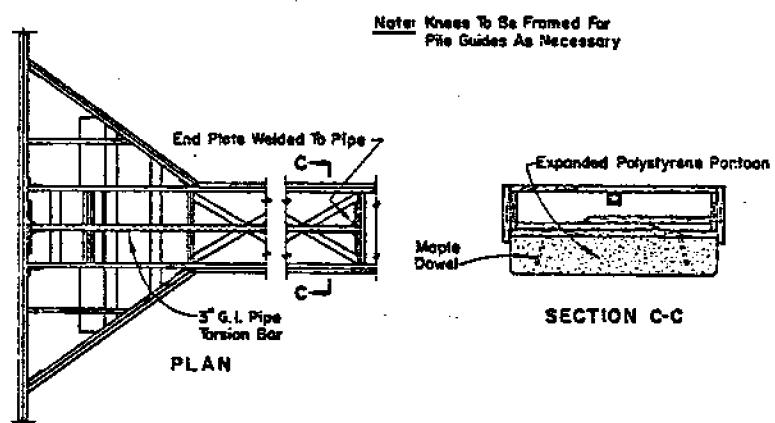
Deck Framing Stiffened with a Torque Pipe
